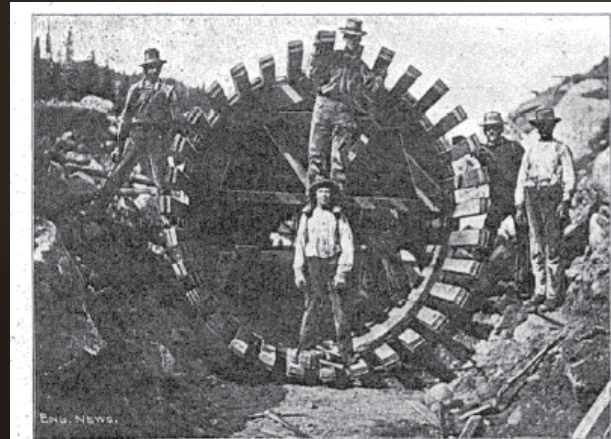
VIEW OF 9-FT. REDWOOD PIPE UNDER CONSTRUCTION, NEAR FLORISTON, CAL.
